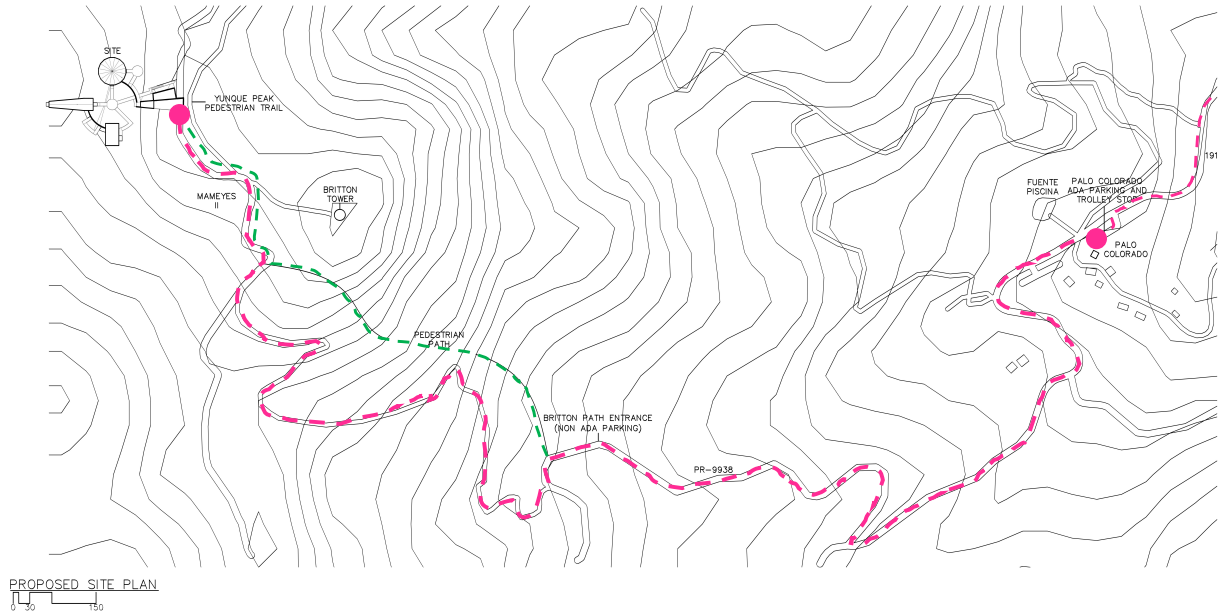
Proposed Site Plan. Diagram by student Reinaldo E. Hernandez Aracena.
